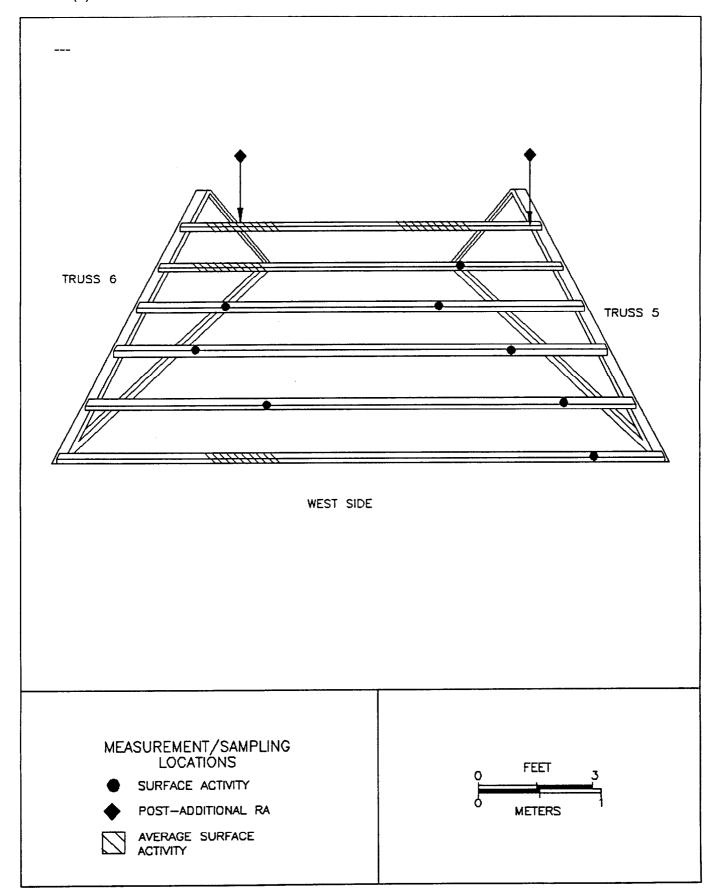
Building 3, Bay 5, West — Measurement and Sampling Locations
